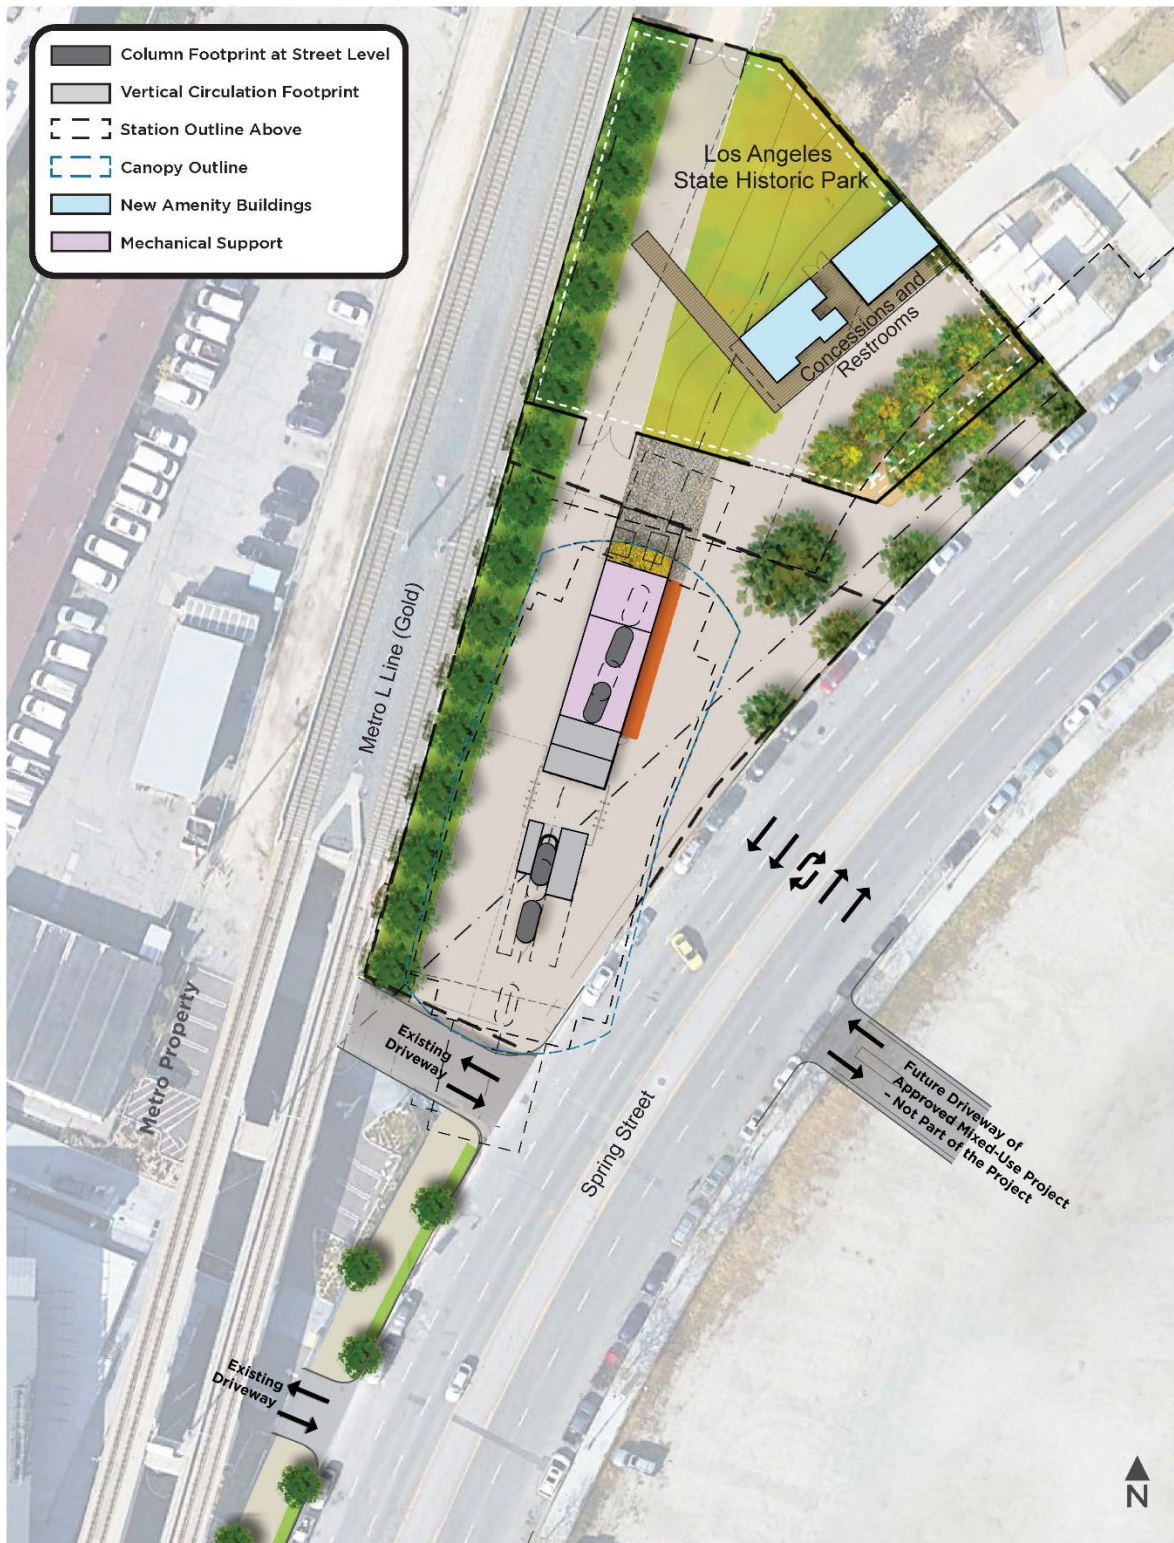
2-29: Chinatown/State Park Station Buildout Conditions
